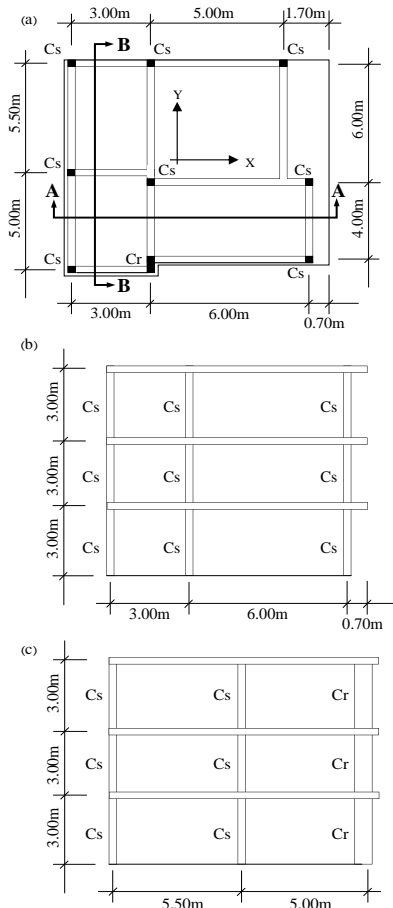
a) Plan view; b) elevation view (section A-A); c) elevation view (section B-B) of 3D concrete building
